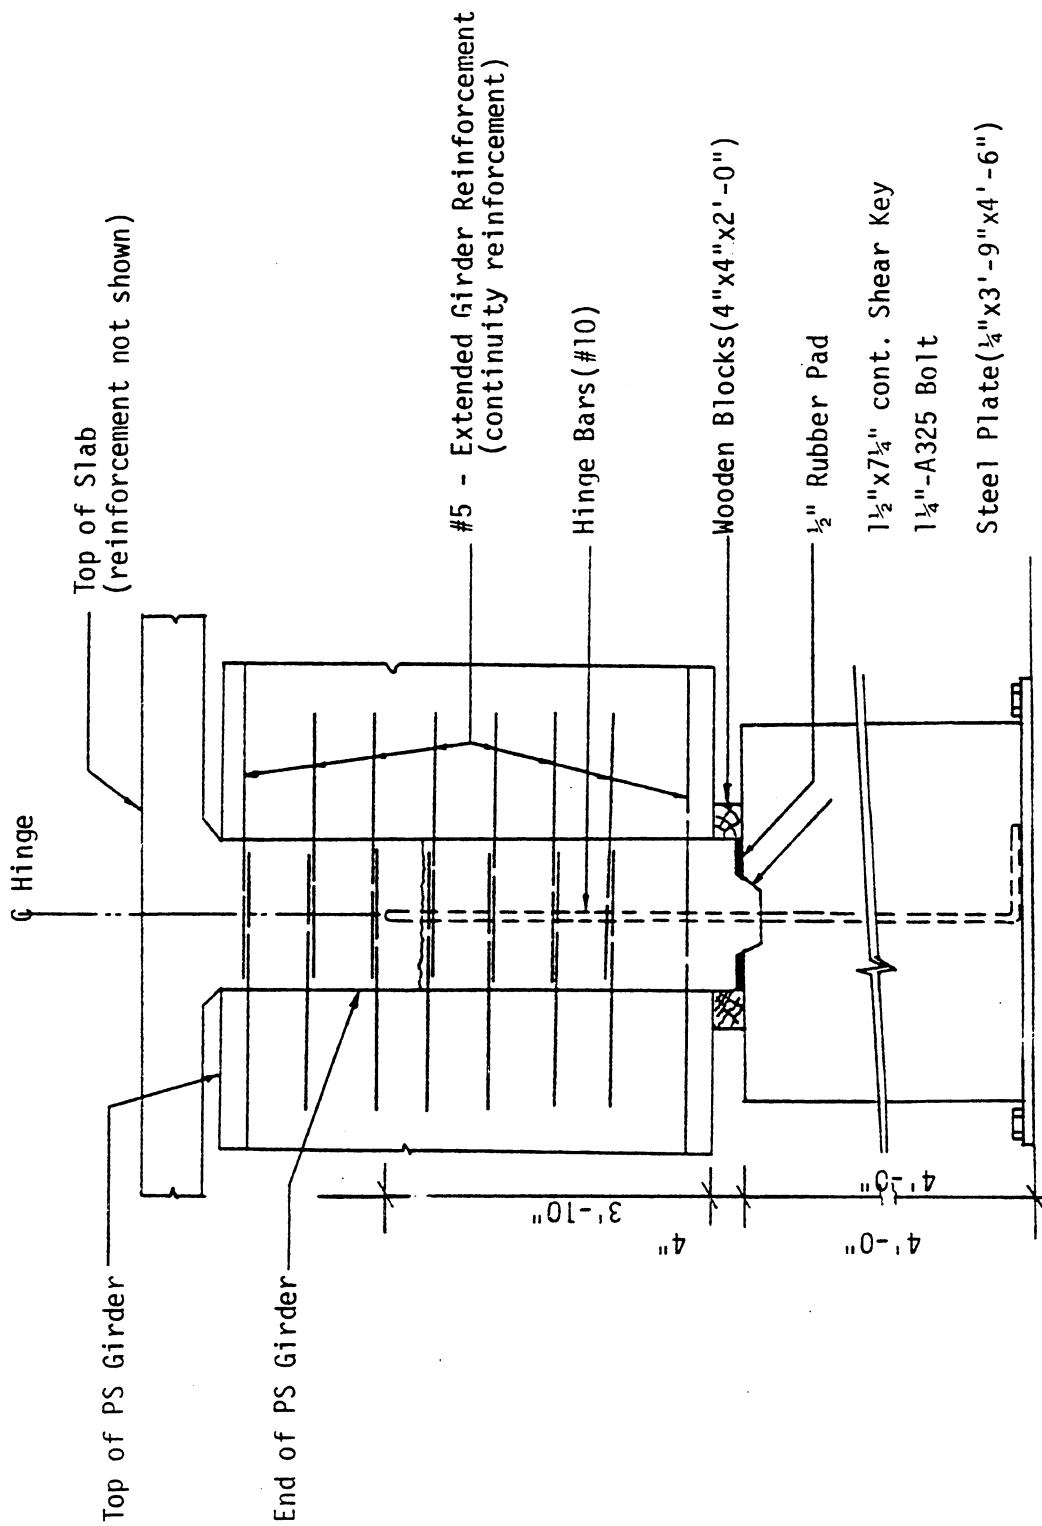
Laboratory Test - Continuity Joint (typ. hinge section)
